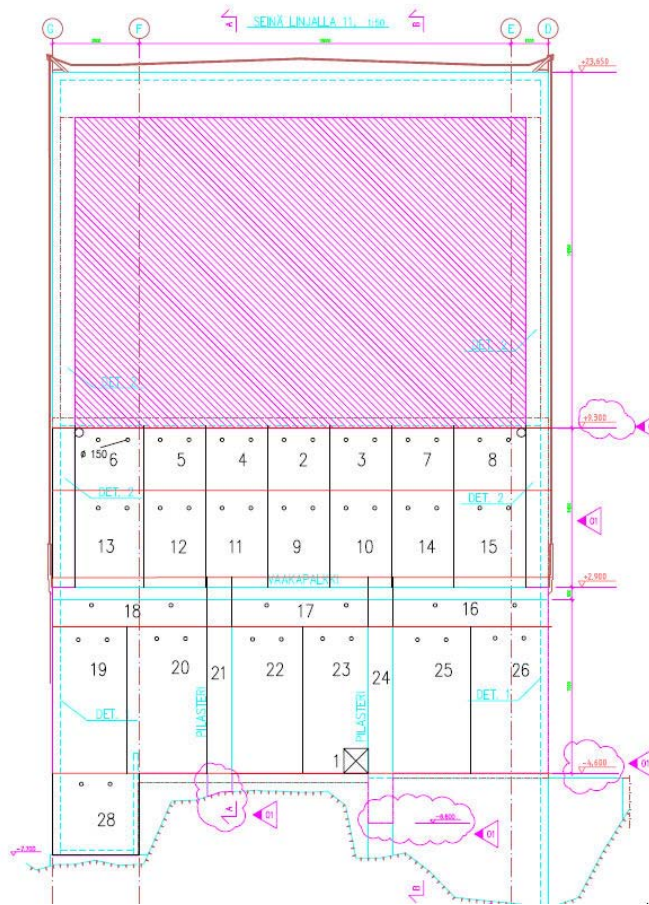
The traditional 2D demolition plan showing the wall demolition pieces and sequence.
